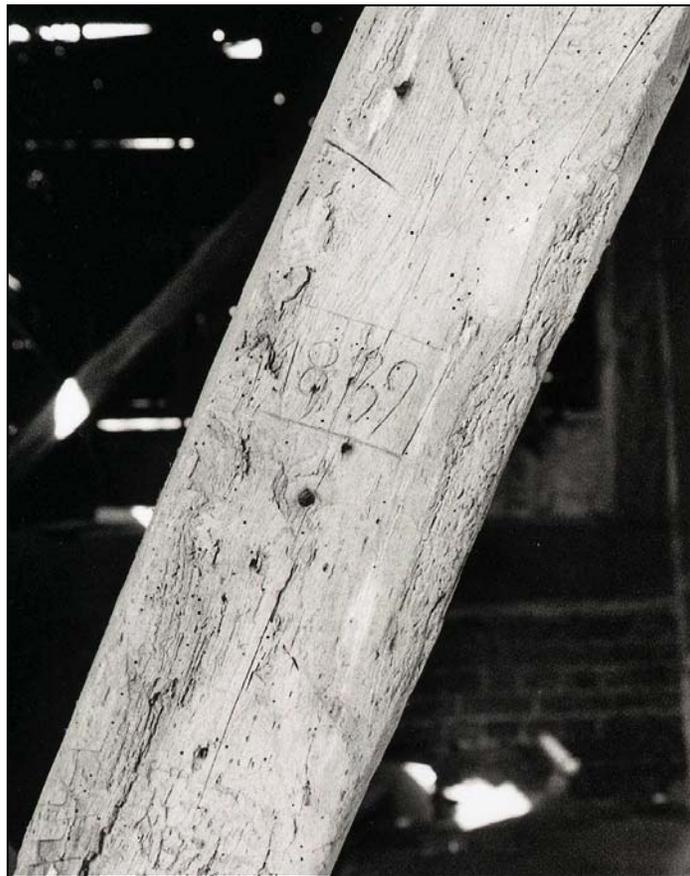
Graffitied date (1839) on strut by brick threshing floor
